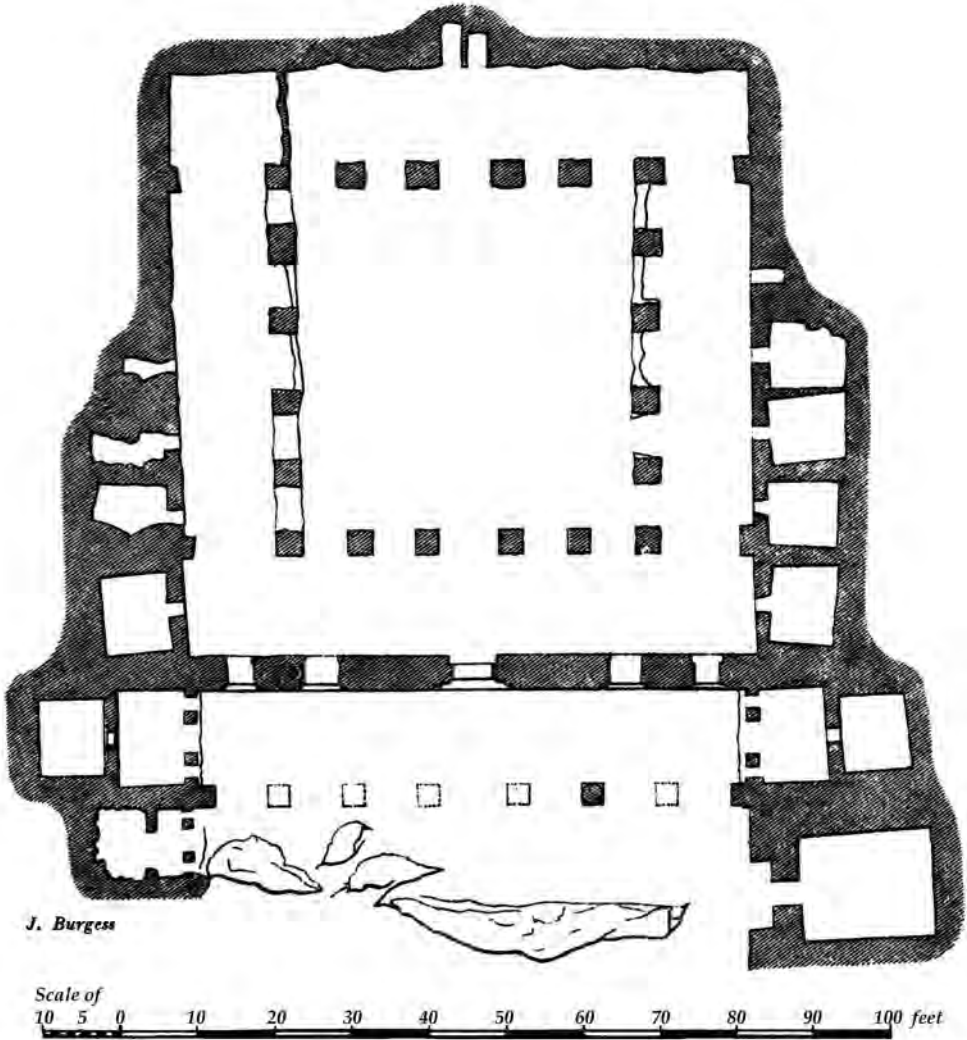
Ajanta Cave 24 plan (BCT 34)
